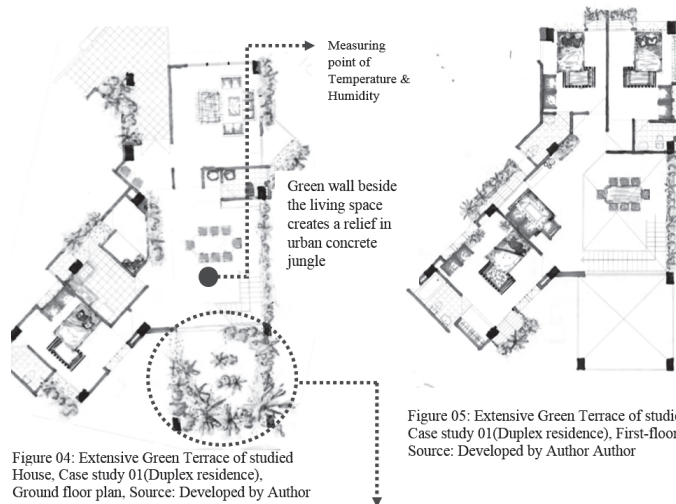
Extensive Green Terrace of studied House, Case study 01(Duplex residence), Ground floor plan. Source: Developed by Author
